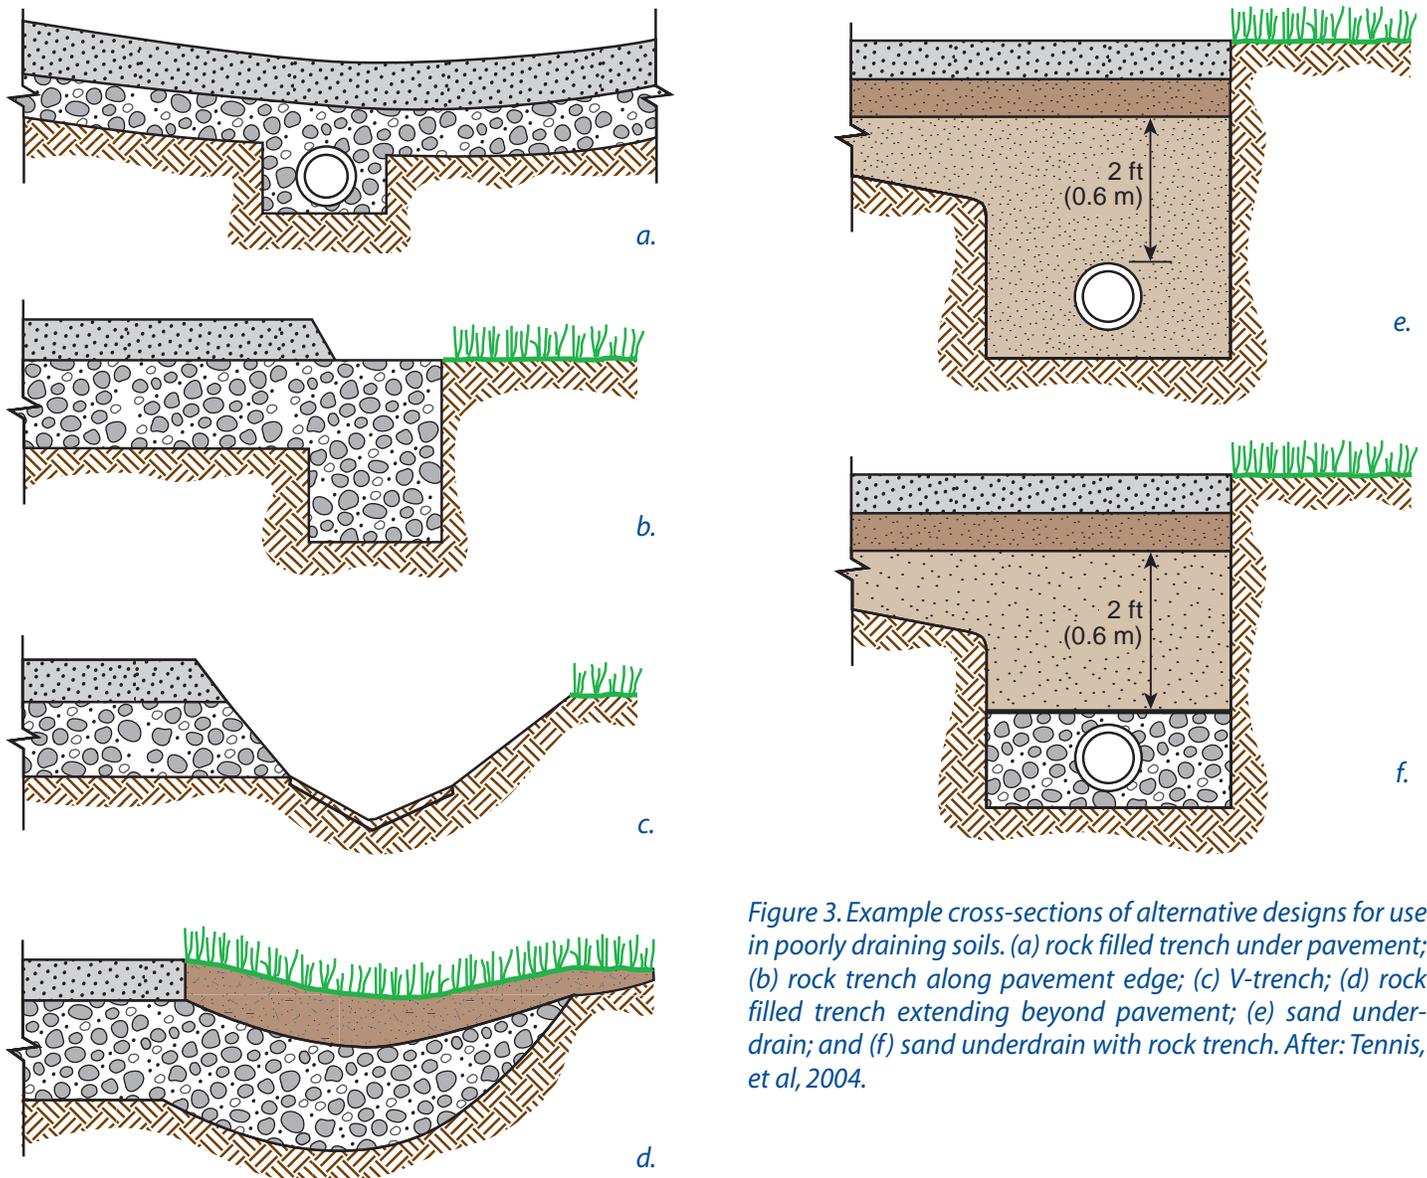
Example cross-sections of alternative designs for use in poorly draining soils. (a) rock filled trench under pavement; (b) rock trench along pavement edge; (c) V-trench; (d) rock filled trench extending beyond pavement; (e) sand underdrain; and (f) sand underdrain with rock trench. After: Tennis, et al, 2004.
